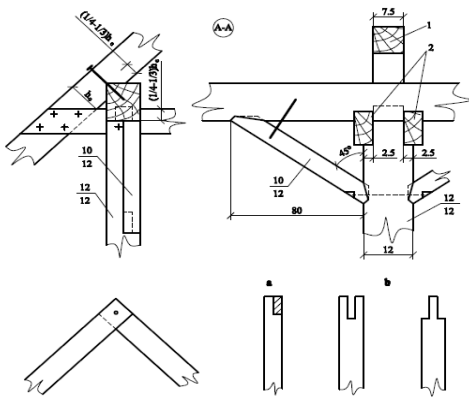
Longitudinal framing walls for 11.00 m < L < 13.00 m
